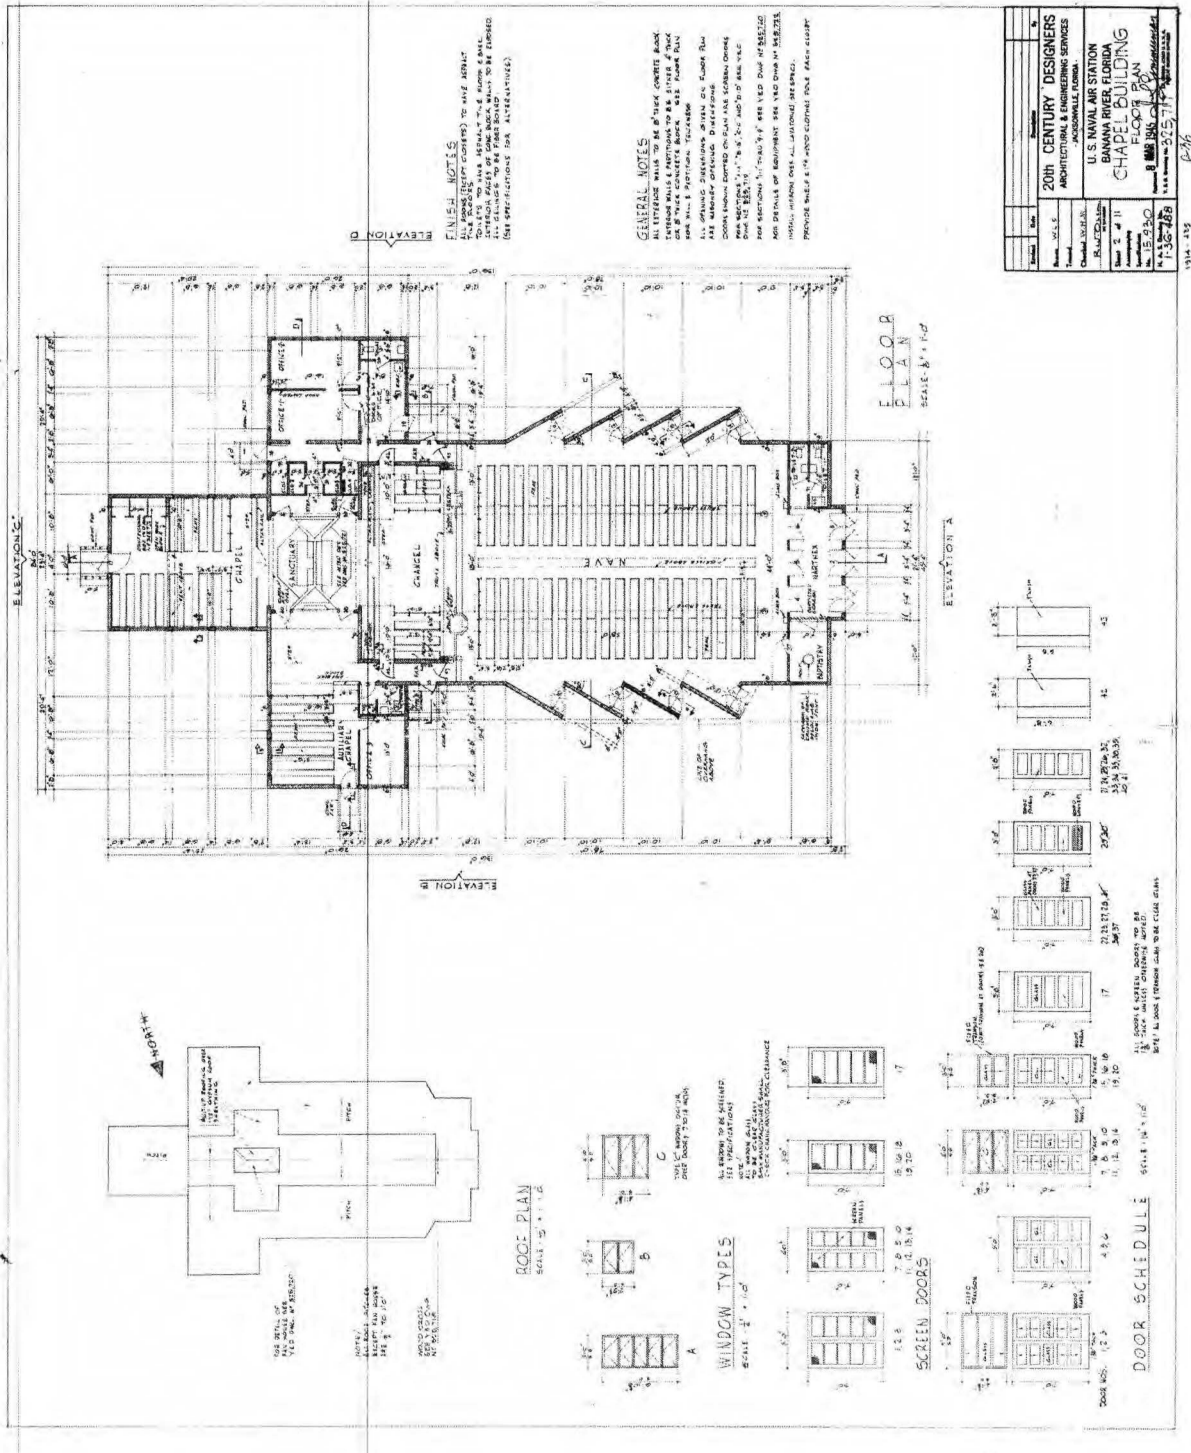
Floor Plan, Chapel Building, U.S. Naval Air Station Banana River, Florida, 8 March 1945.
